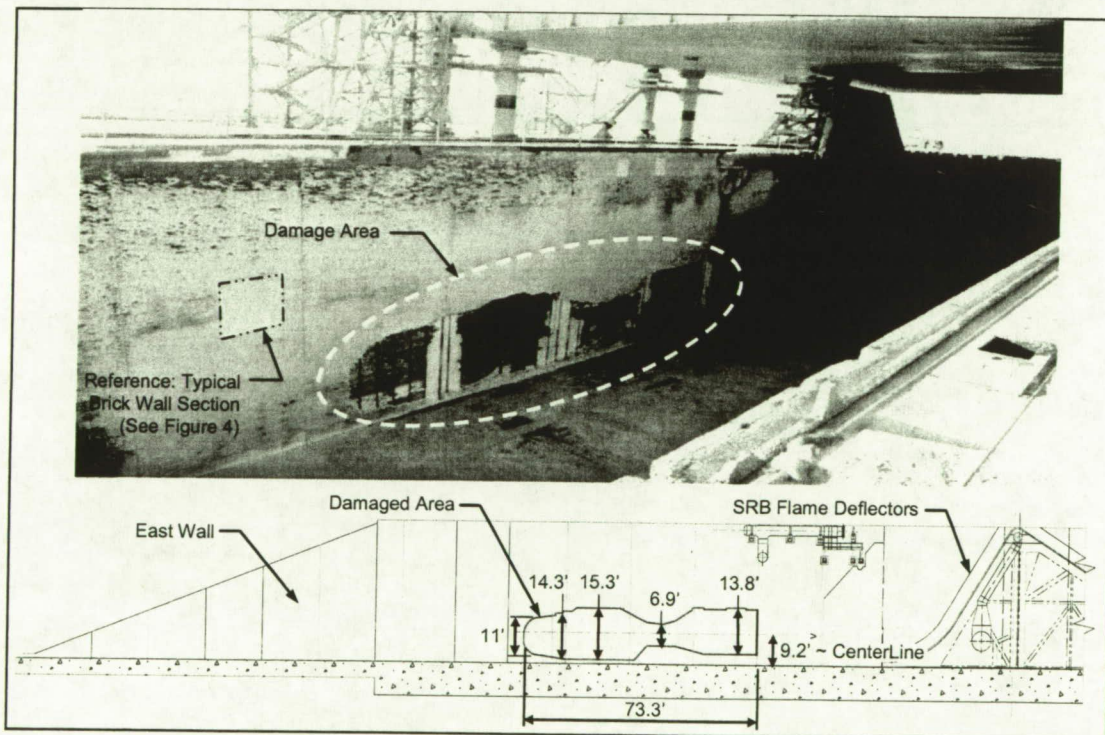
Launch Complex 39 Pad A Flame Trench Post STS-124 Damage
